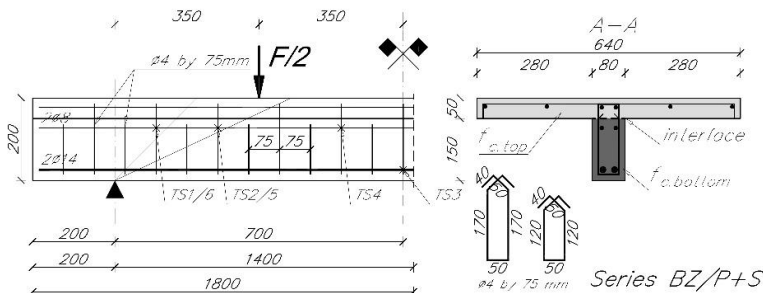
Details of beams tested: a) longitudinal section, b) cross-sections; TS1/6, TS2/5, TS4 – strain gauges on the stirrups, TS3 – strain gauges on the main bar. *Source:* own study
